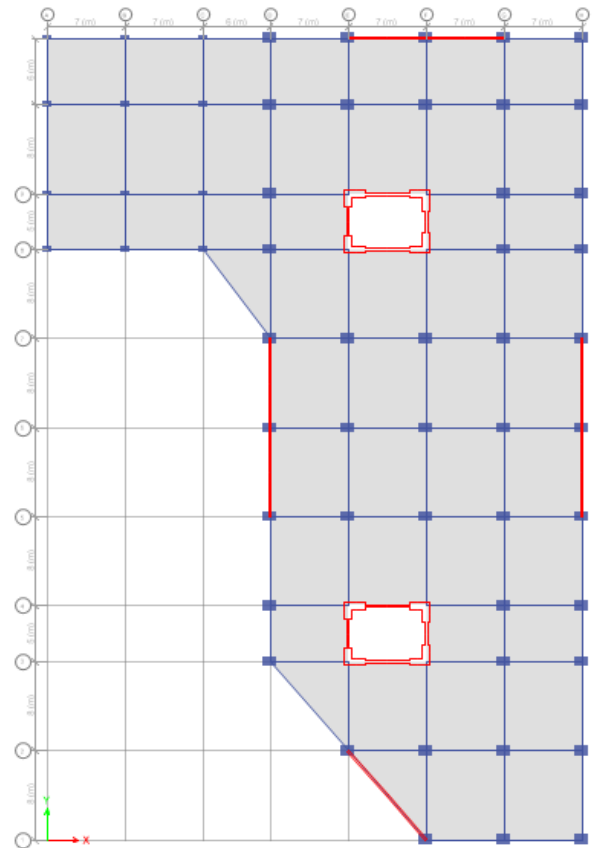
Typical Floor Plan: from base to 12 story level : Shear wall At middle portion
